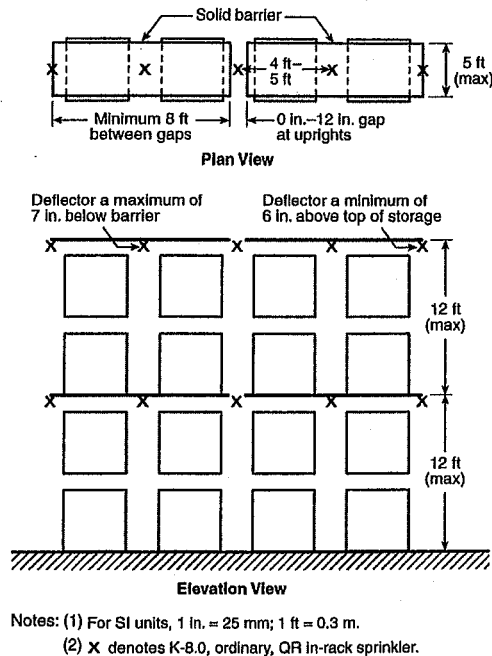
(a) Single-Row Rack Sprinkler Layout for Design Scheme "A." [30: Figure 16.6.1.1(a)]
